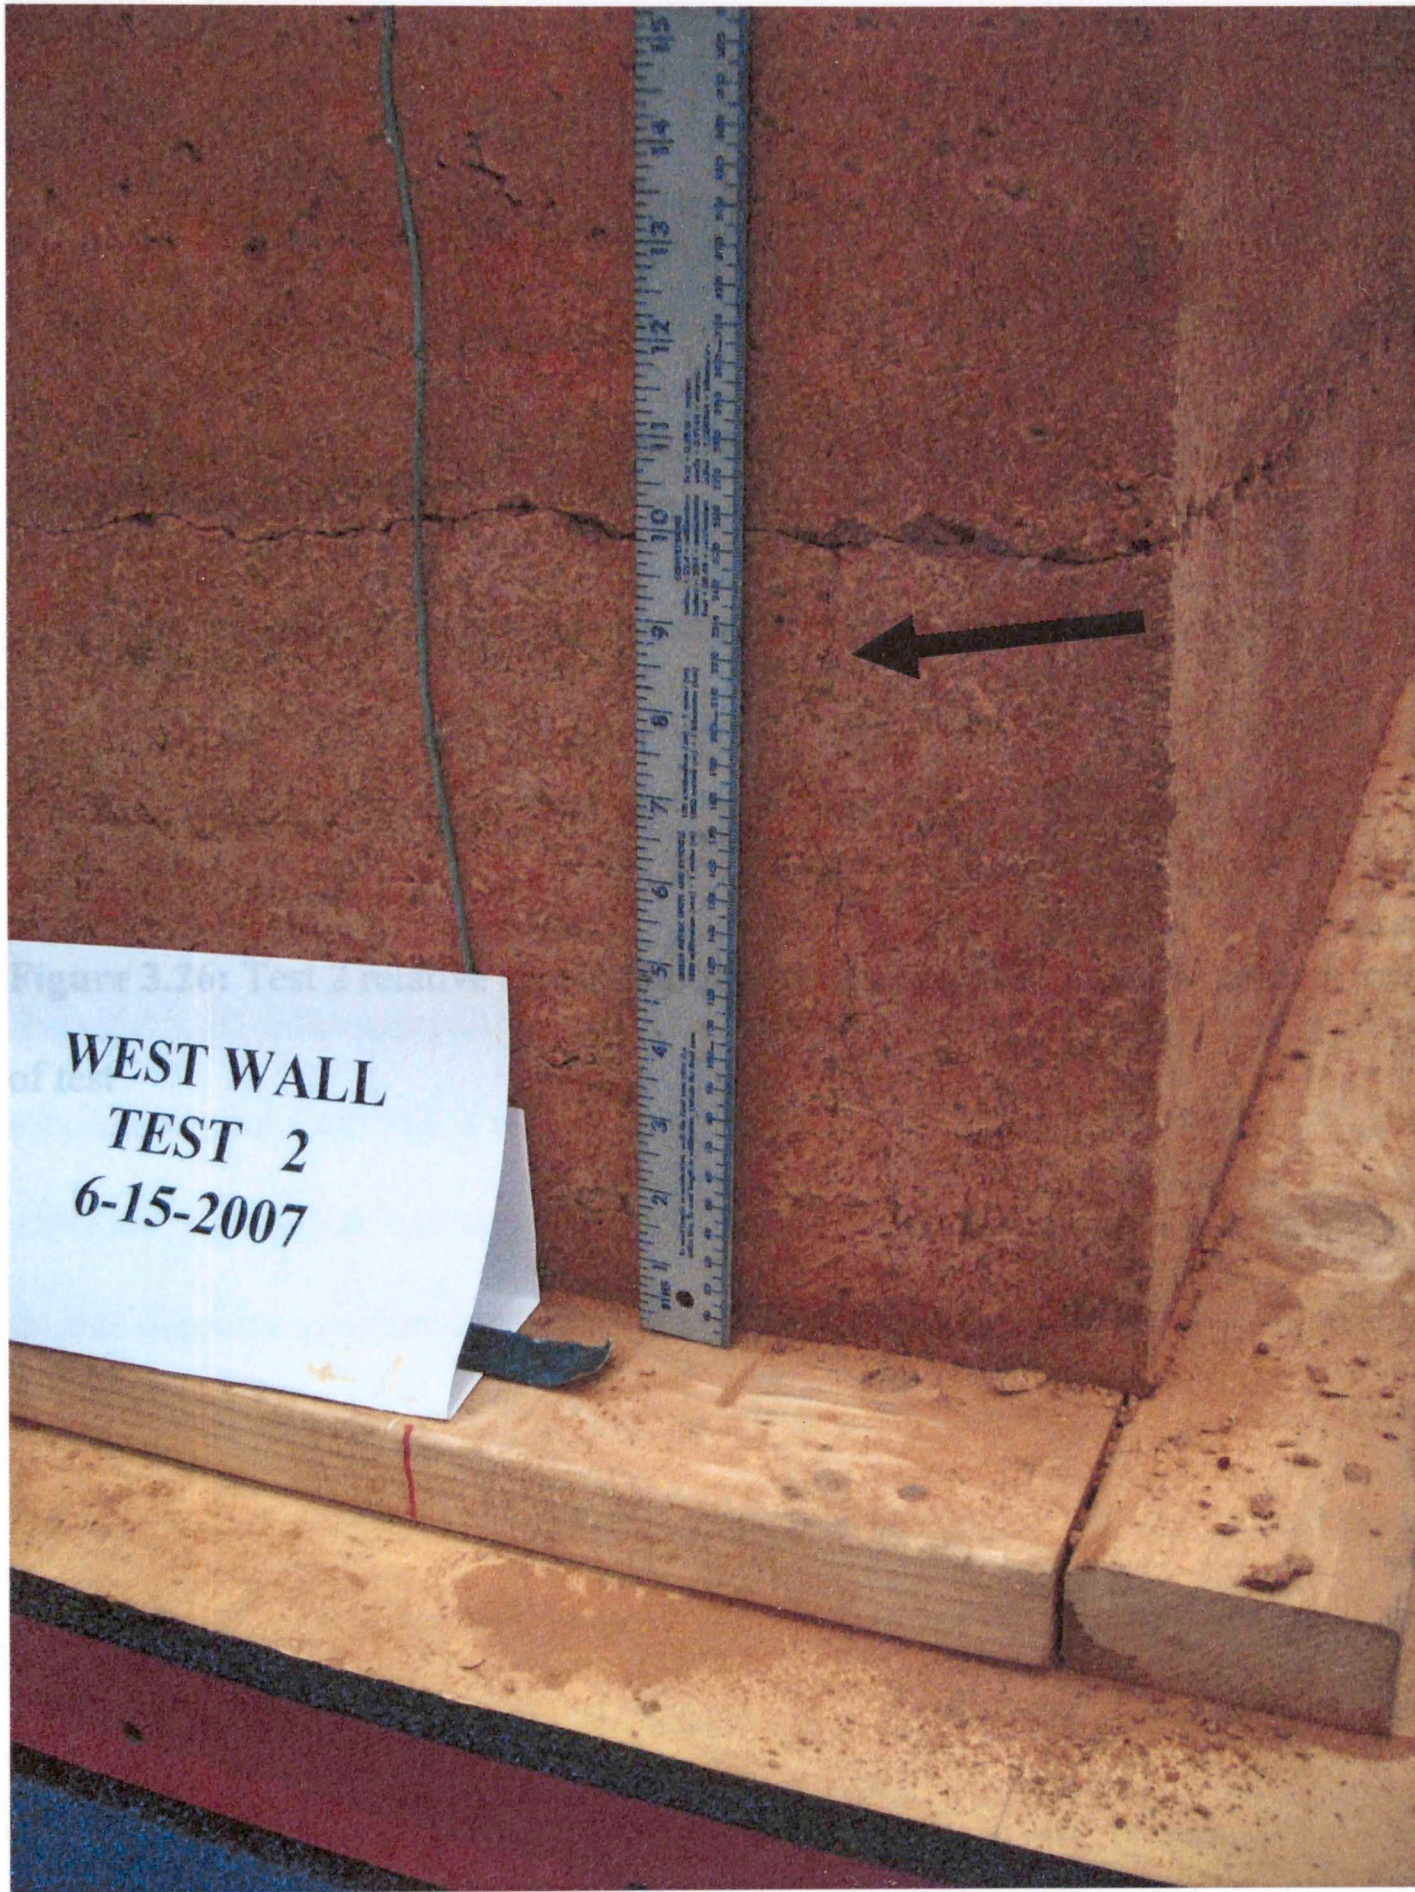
Test 2 vertical crack at SW corner below delaminated layer
